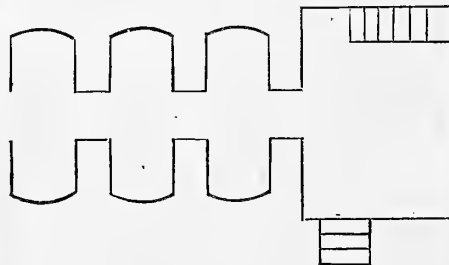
FLOOR PLAN OF THE CELLAR.
